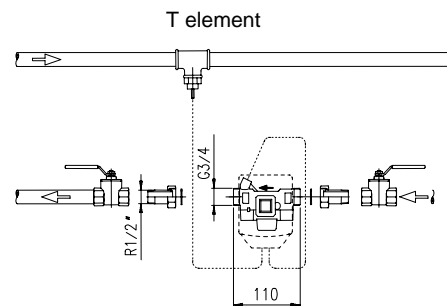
Example of mounting with a T element and heat meter with 110 mm fitting
